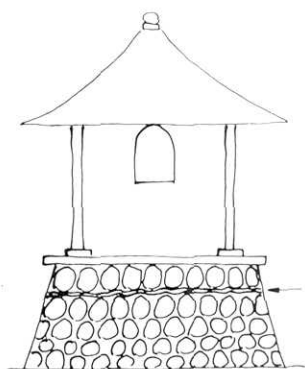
Cracks in the foundation of a bellfry.
